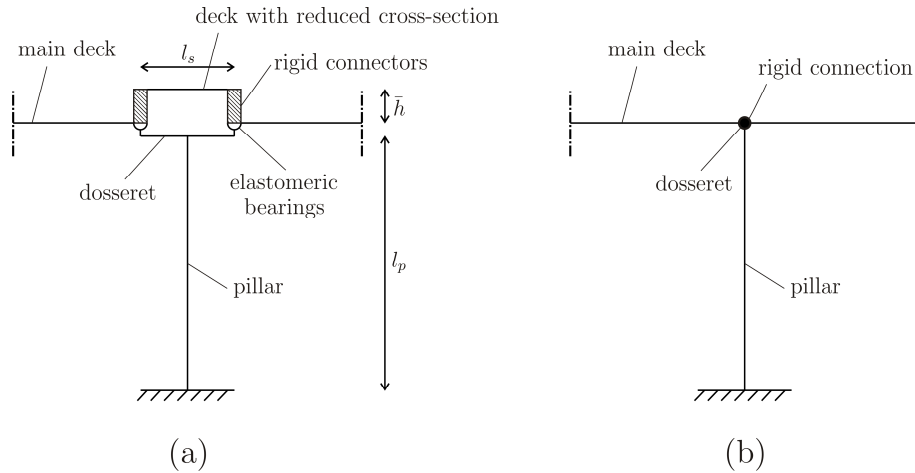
Structural schemes for a repetitive unit of the actual bridge (a) and for a bridge with a continuous beam rigidly connected to the pillars (b).
